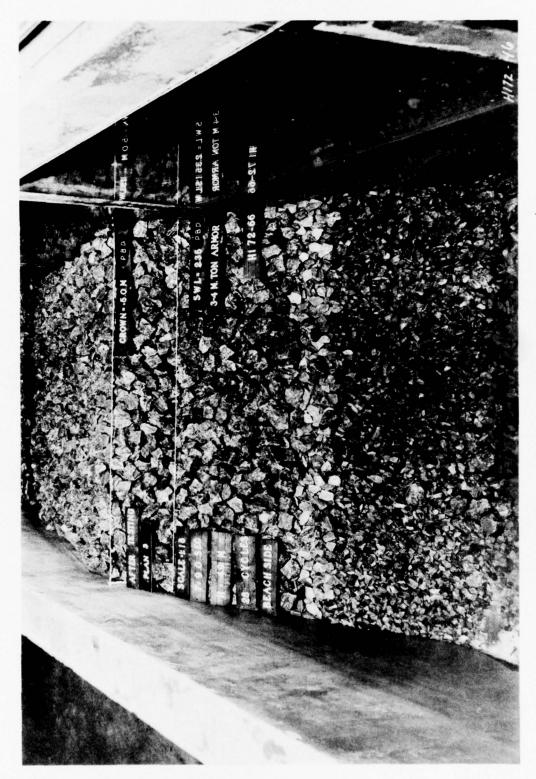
Beachside view of Plan 3 after attack of 9-sec, 4.9-m waves at a swl of +2.35-m PBD
